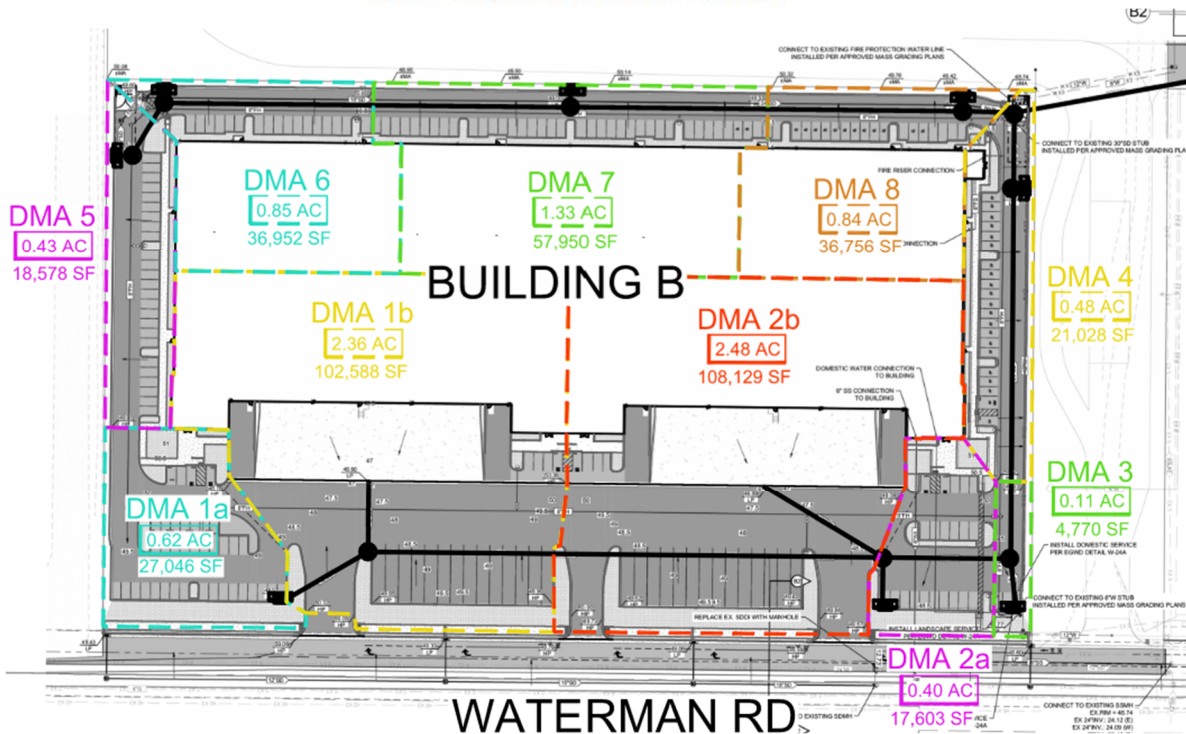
Site Plan for Waterman Brinkman Logistics Center
